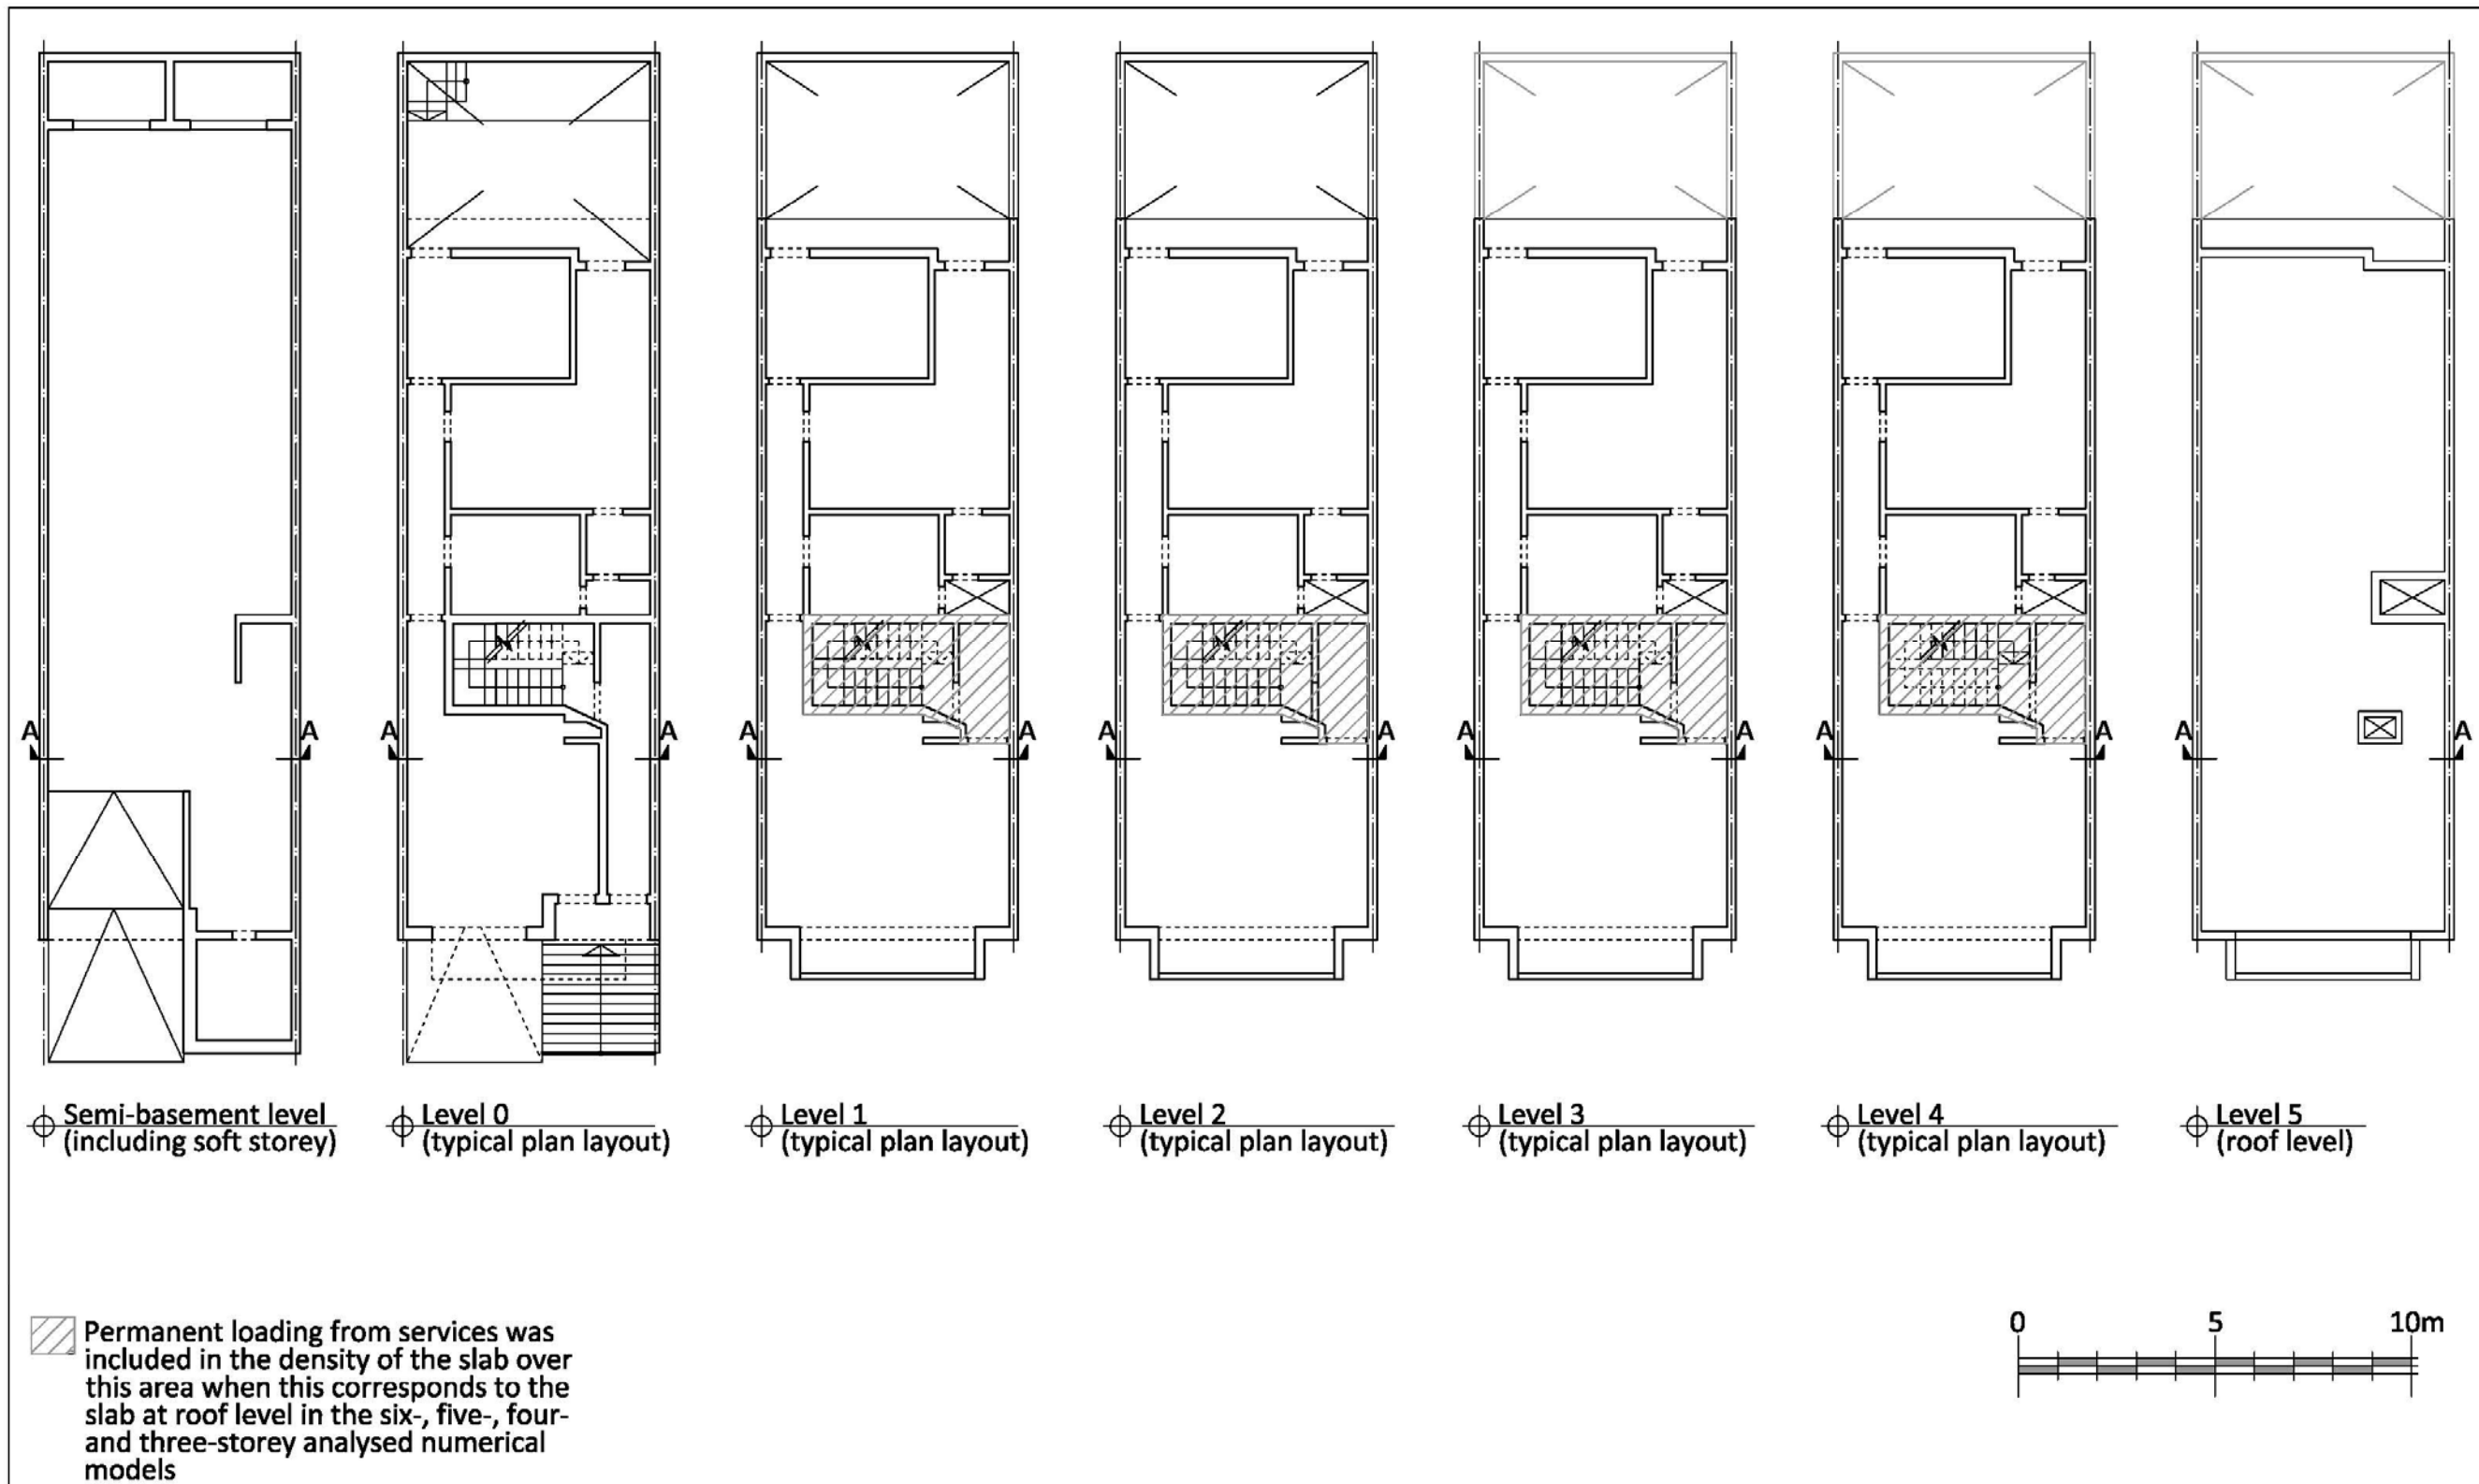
Plan layouts at all levels for analysed single building numerical models including a soft storey at semi-basement level (plan length-to-width ratio 2.75:1).
